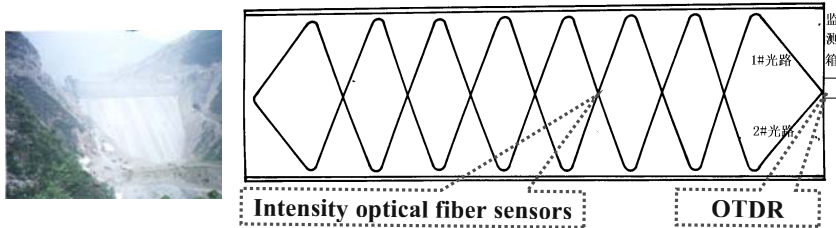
Gudongkou Concrete Face Rockfill Dam and optical fiber monitoring system for the crack of Gudongkou Concrete Face Rockfill Dam
